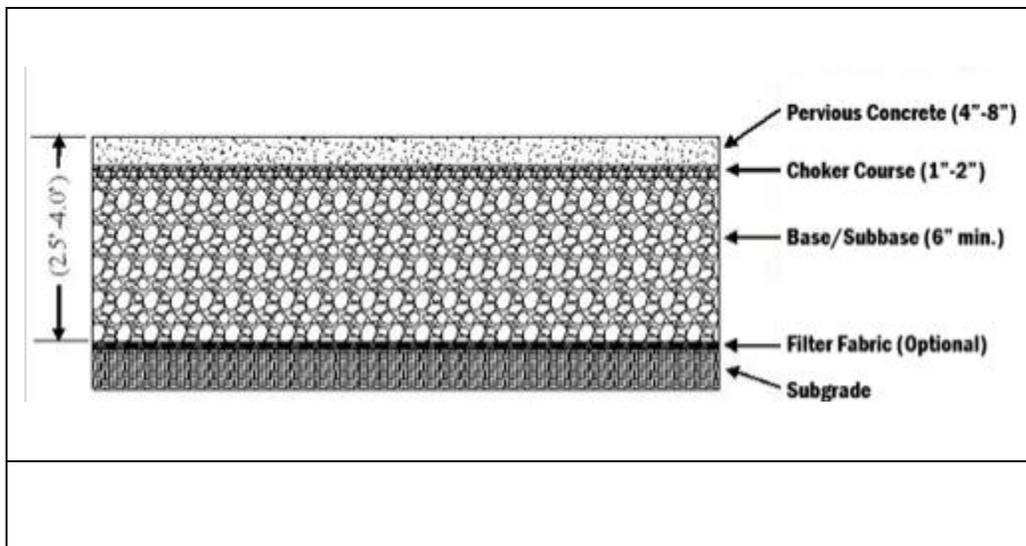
Typical permeable concrete pavement section (diagram adapted from US EPA).
